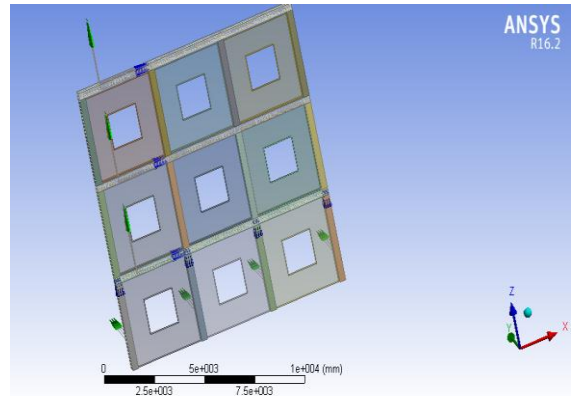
Three-Storey Three-Bay Frame with infill wall with opening
